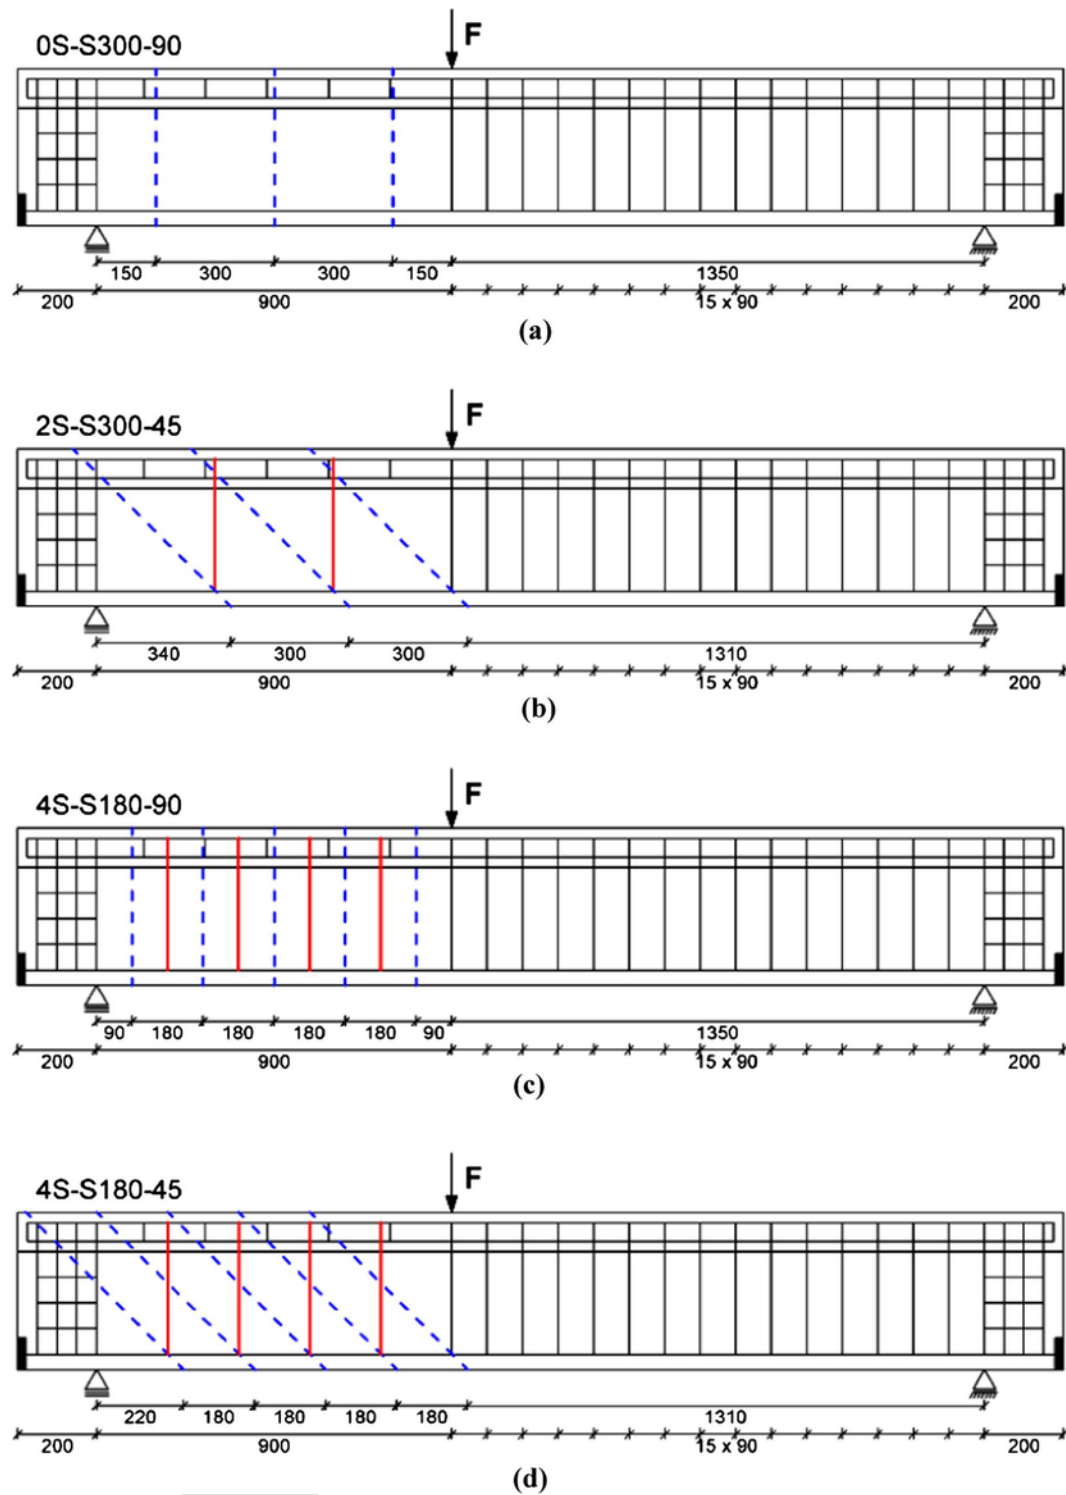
Tested strengthening arrangement: (a) 0S-S300-90, vertical ETS spaced at 300 mm; (b) 2S-S300-45, inclined ETS spaced at 300 mm, (c) 4S-S180-90, vertical ETS spaced at 180 mm, (d) 4S-S180-45, inclined ETS spaced at 180 mm.
